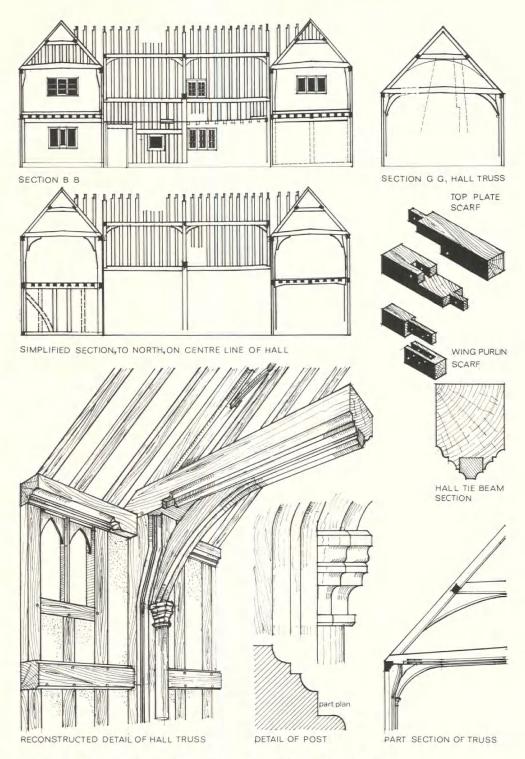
Clawdershill Farm, Shillington: sections and framing details. Scale as figure 6.
